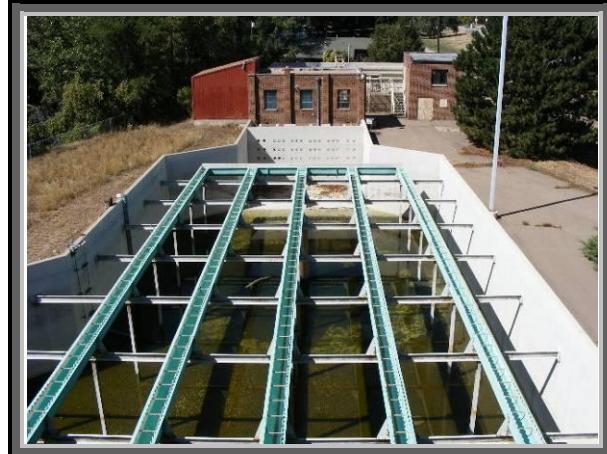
View across the site to the north, taken from the south central portion of the South Plant.
